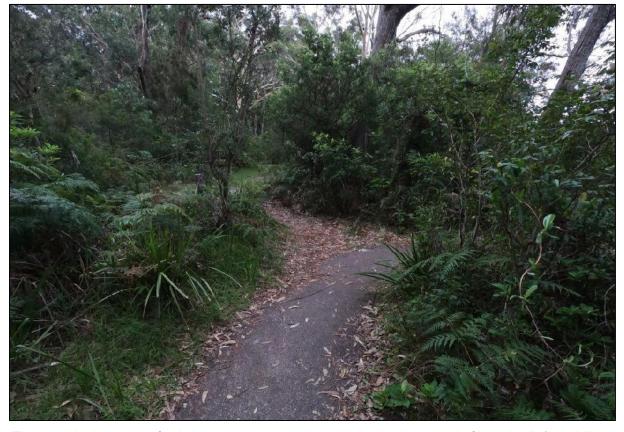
Northern end of existing concrete path where it joins landward end of boardwalk (not visible on right). Hardstand for assembly of boardwalk components would be established in coastal sand forest here.
